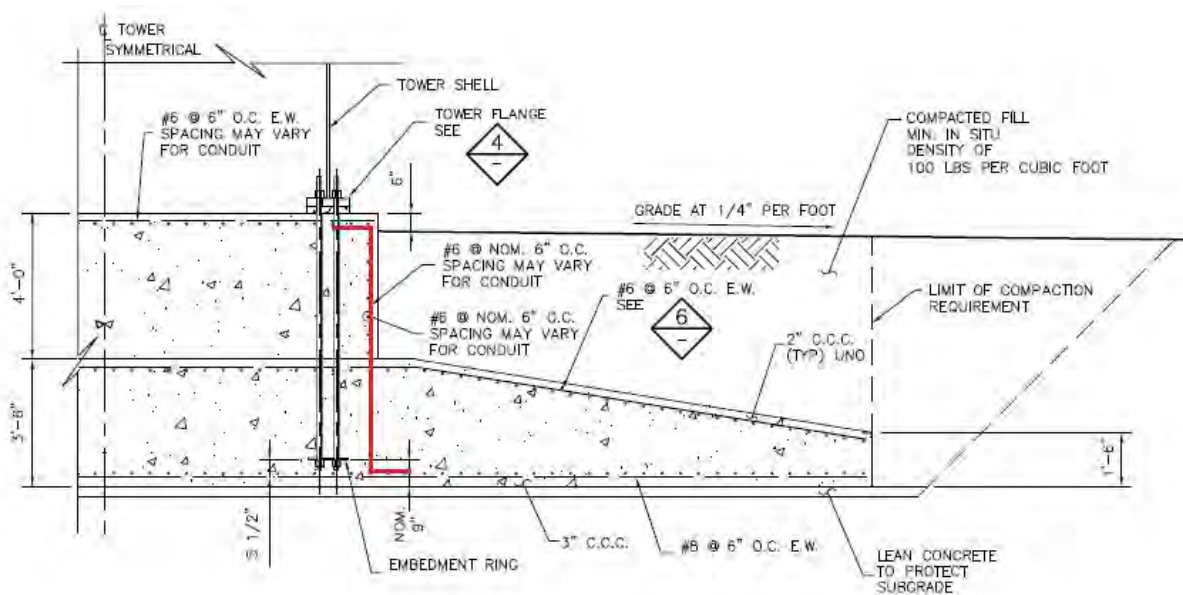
Pre-2010 Foundation design with minimal vertical reinforcement.
